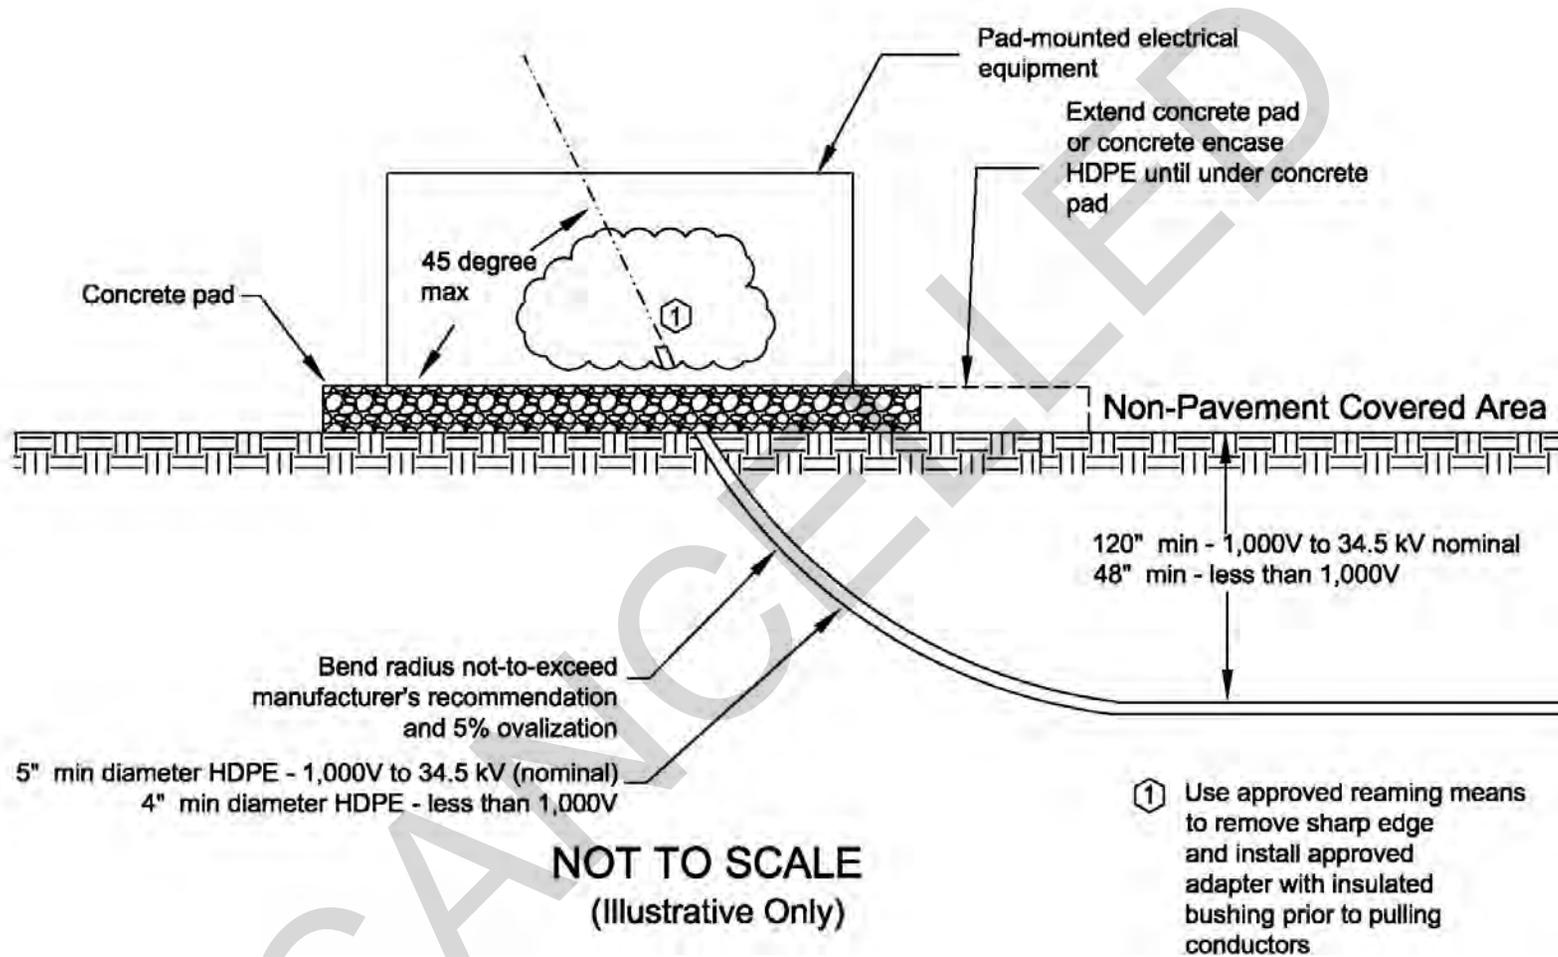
Non-Pavement Covered Area to Electrical Equipment Transition – HDPE Conduit (20°–45°)
